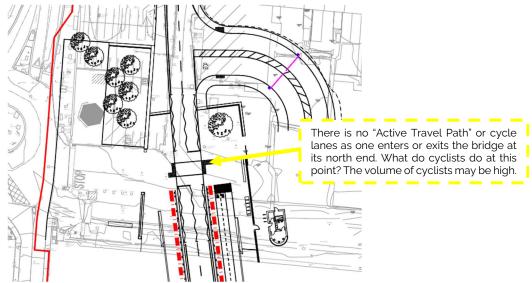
Excerpt from the applicant drawings showing cycle lanes terminating on the north side of the SPAR bridge (Source: Dwg. No. CP1901_3FM-RPS_S26-GEN-XX-DR-HE-100-0001)
